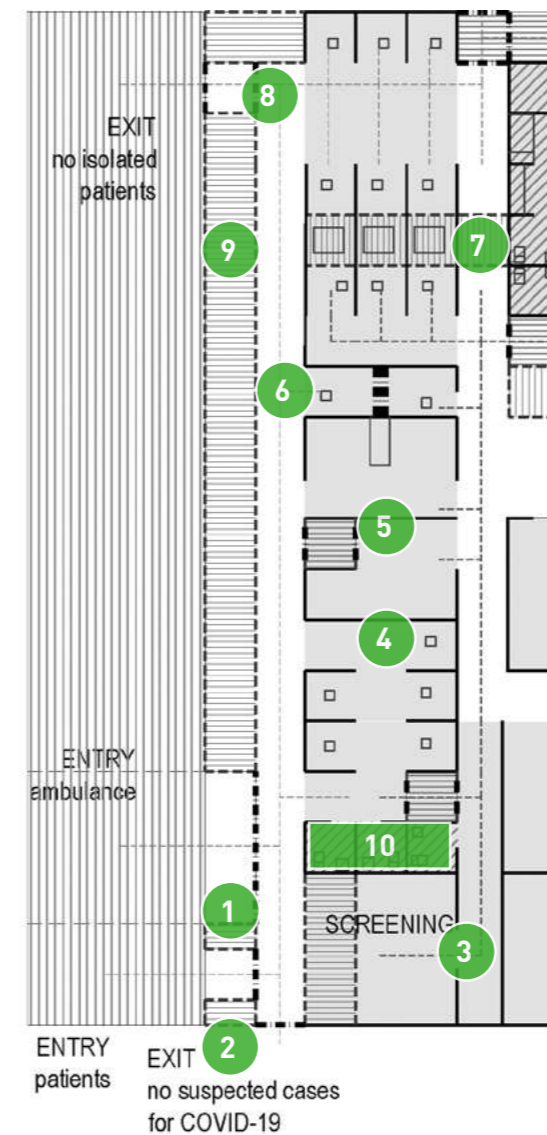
Model M: 180 beds (100 m x 80 m) - detailed layout
